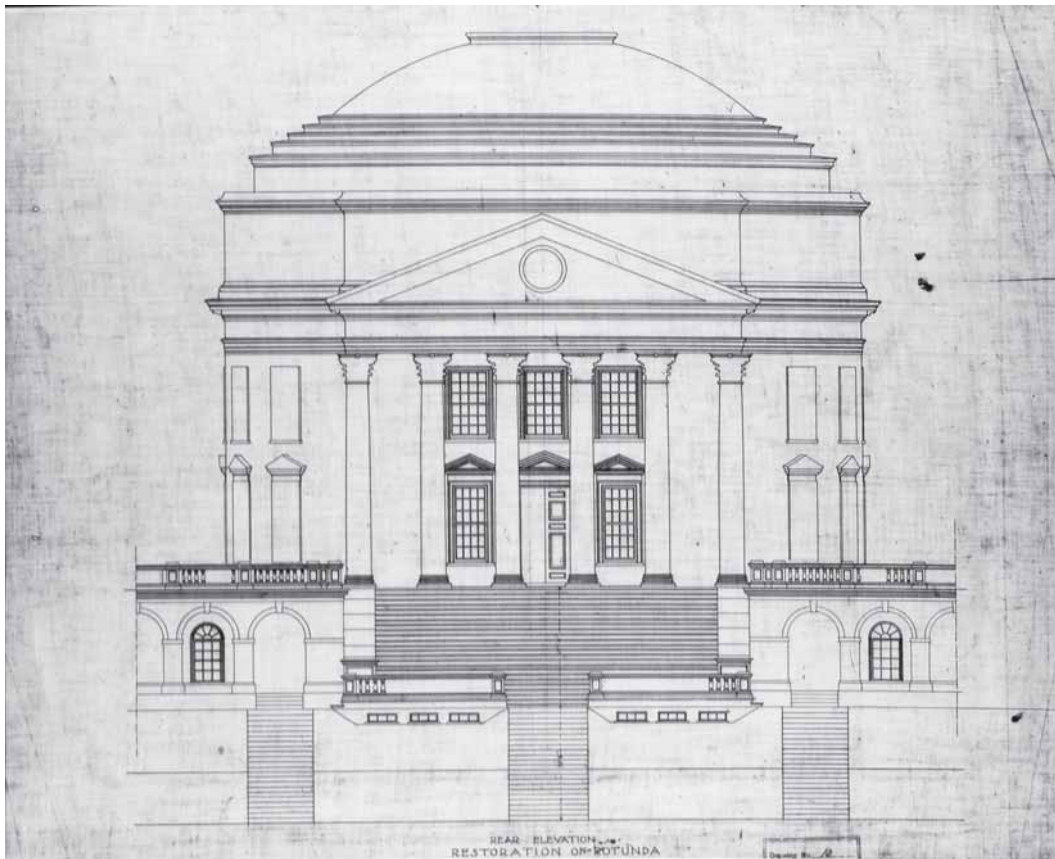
McKim Mead & White drawing of the north elevation. [Special Collections, UVA]
